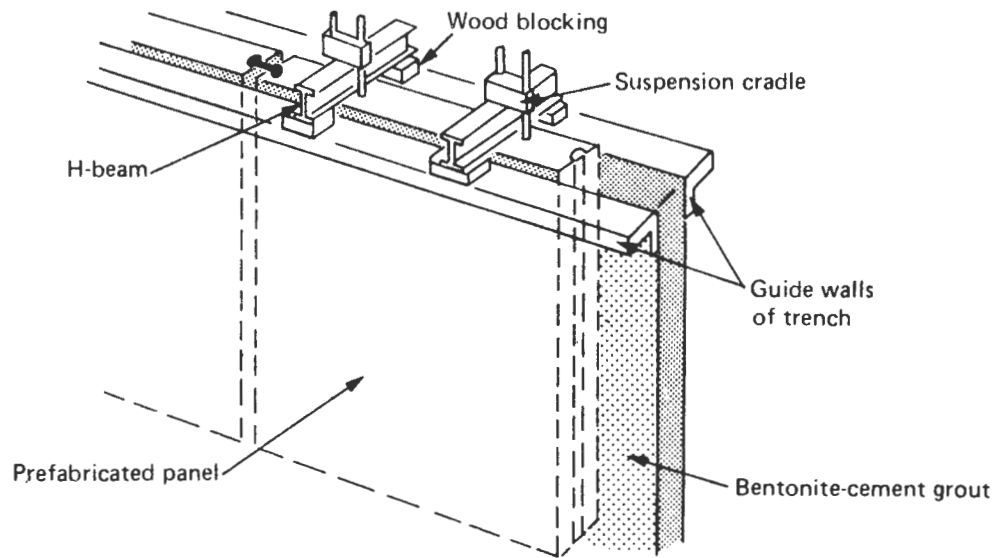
Three Dimensional View of a Prefabricated Concrete Wall
